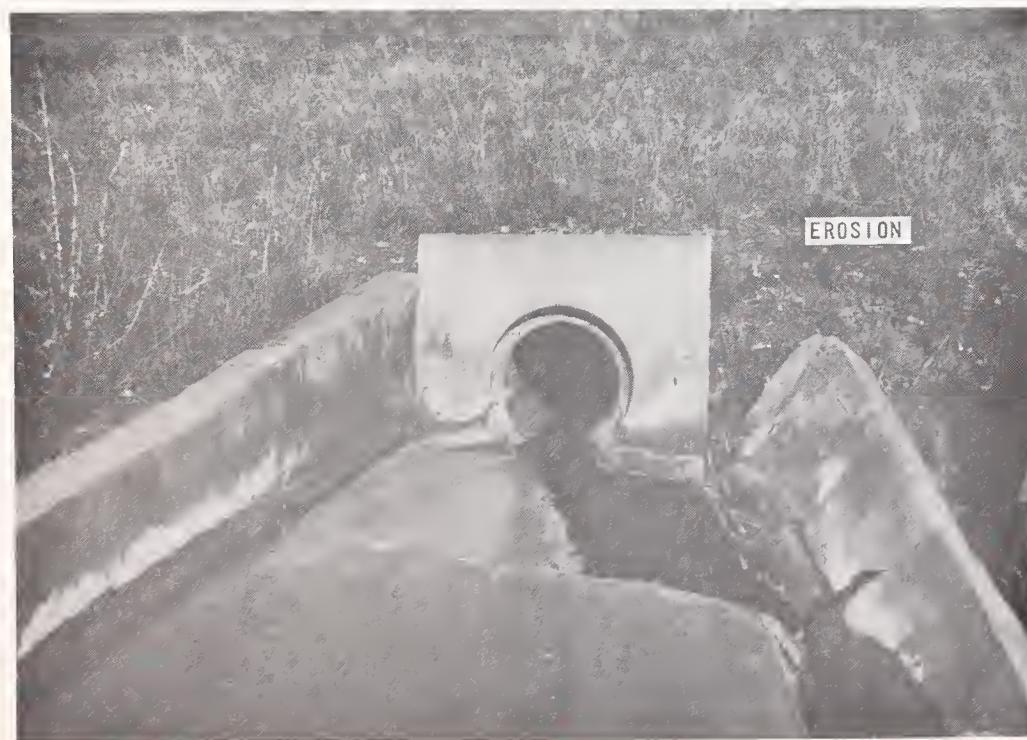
VAUX #2 SPILLWAY INLET — LOOKING UPSTREAM
